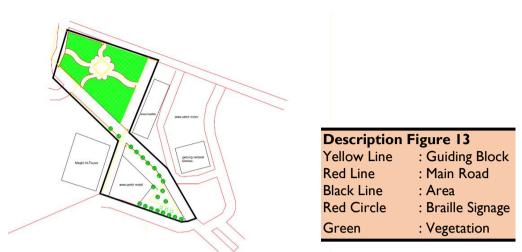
Plan for the Addition of Guiding Blocks and Braille Signage
